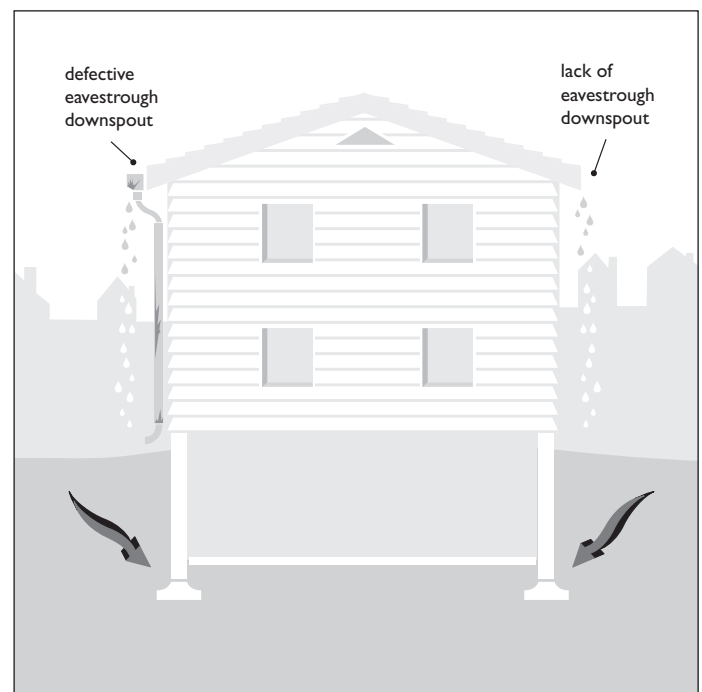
Lack of, or defective, eavestroughing and downspouts
